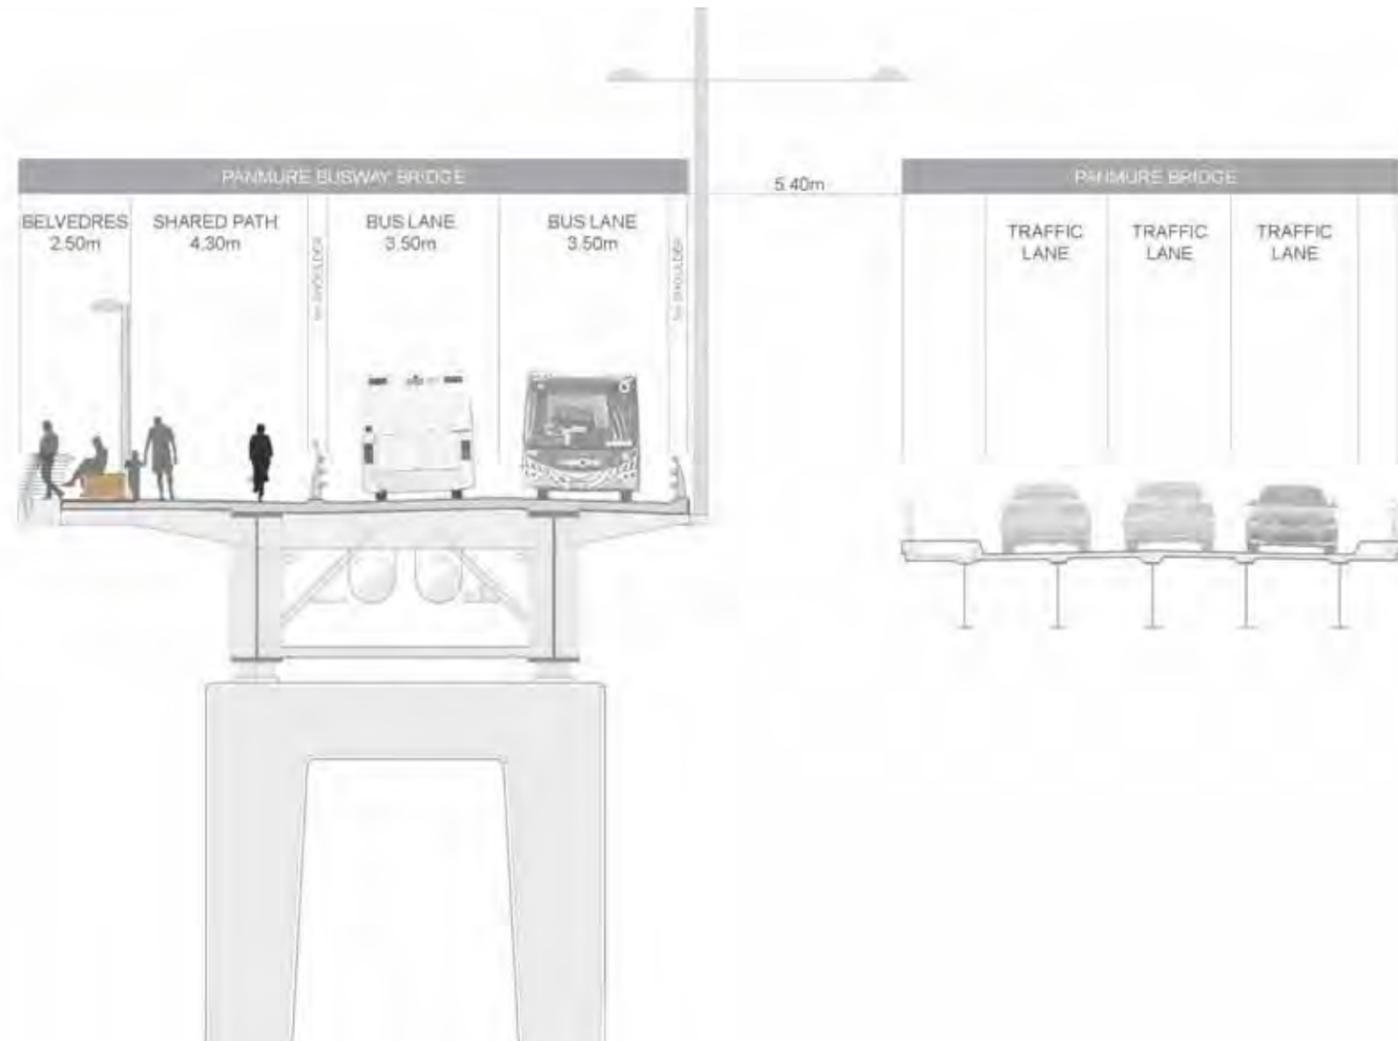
Section H-H through the new busway bridge (left) showing the viewing platforms / belvederes and relationship to the existing Panmure bridge
